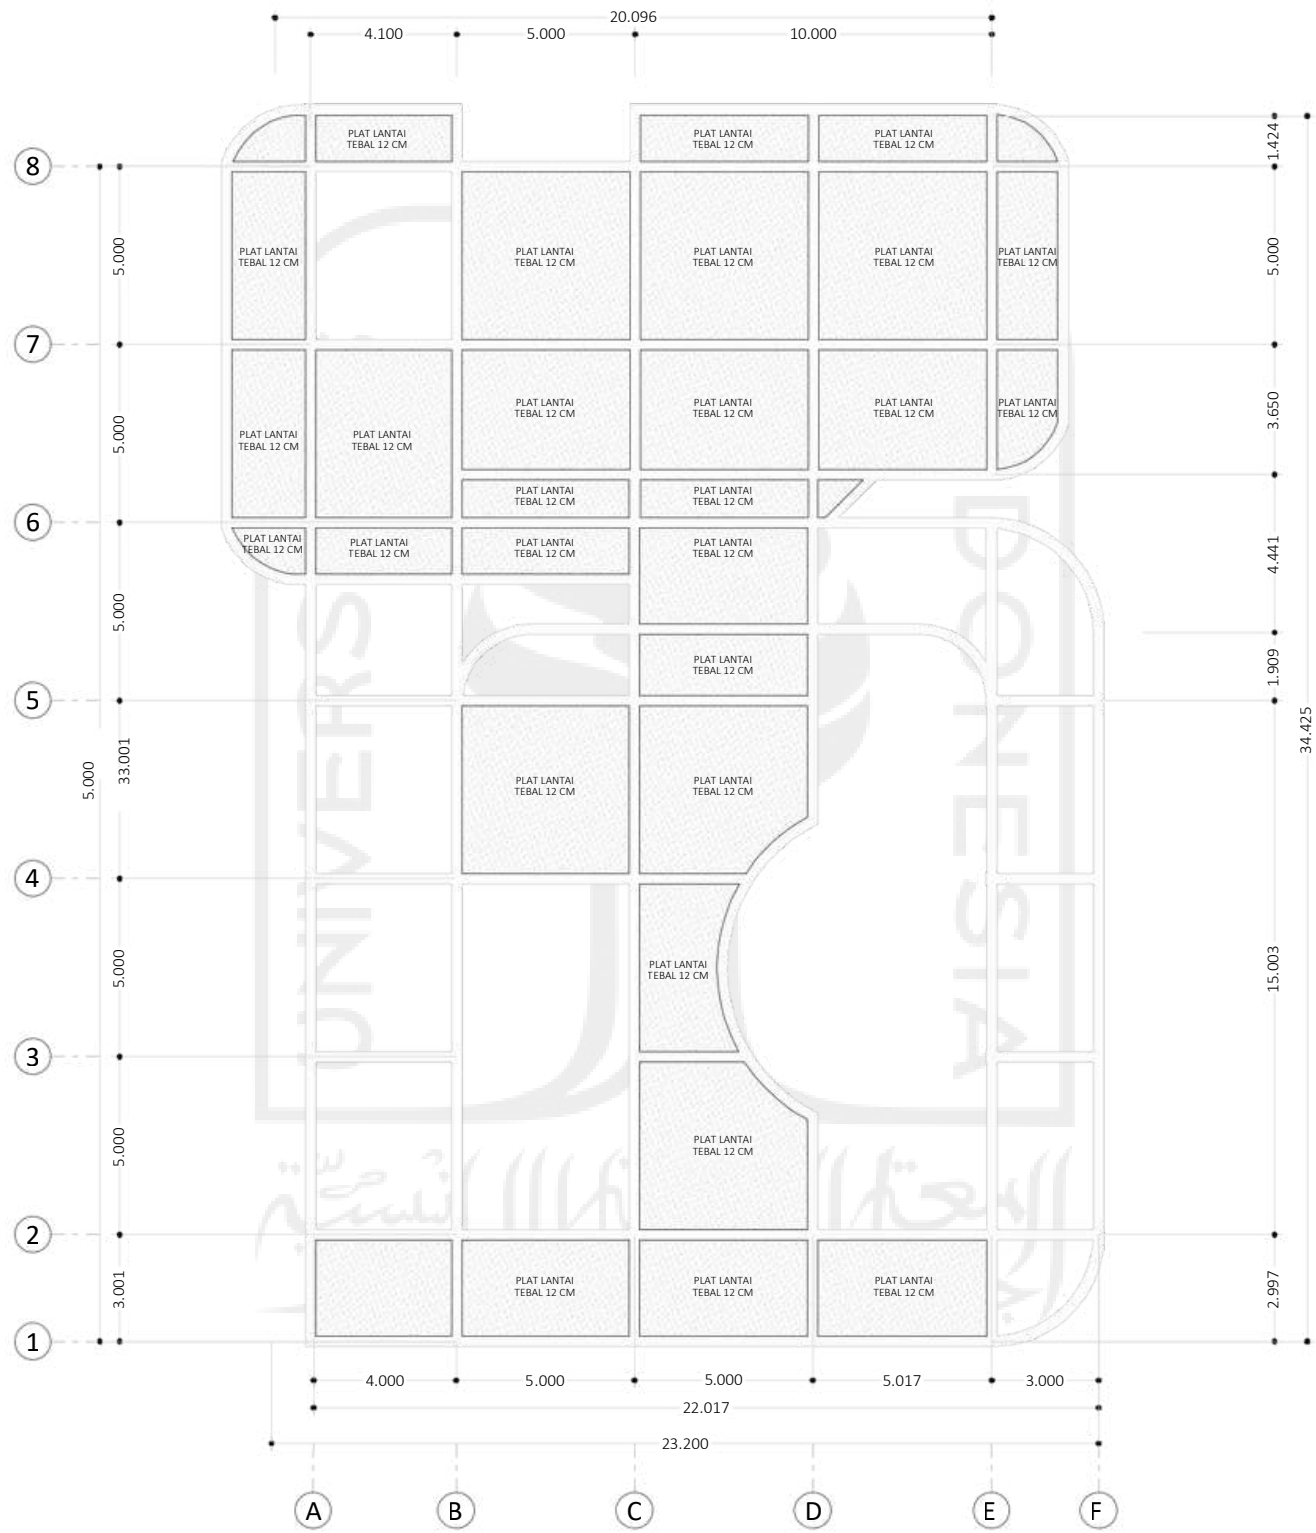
ST FLOORS (BUILDING B1)
